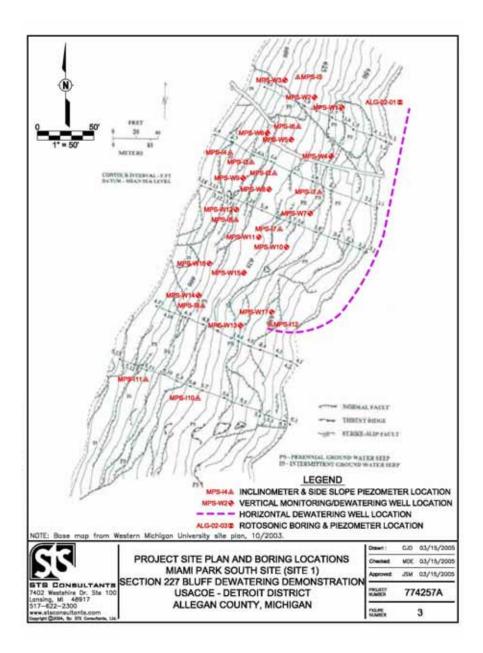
Site plan of Miami Park South bluff stabilization demonstration project. Remediated site instrumentation is just upslope of MPS-I7, and control site instruments are just upslope of MPS-I10.
